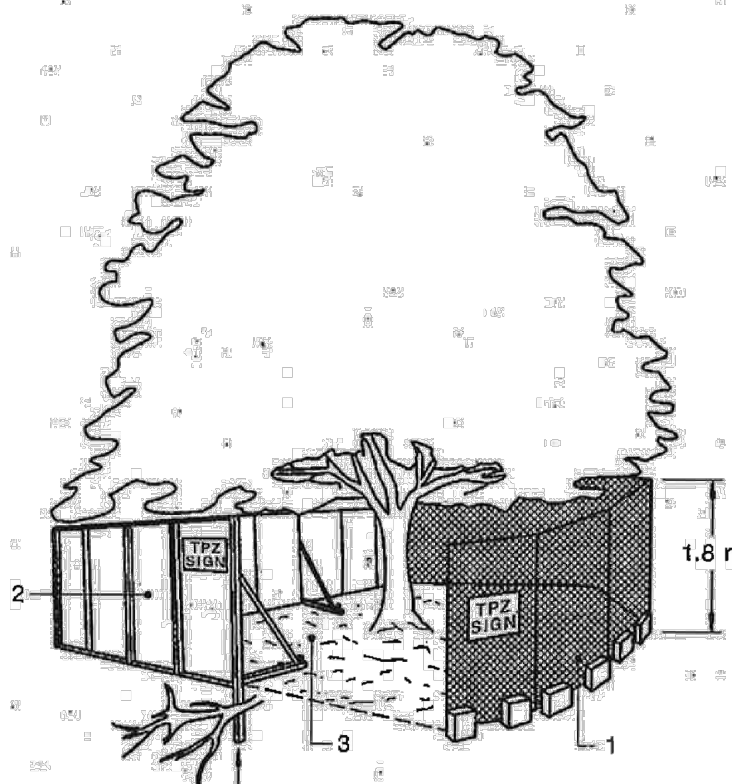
EXAMPLES OF TRUNK, BRANCH AND GROUND PROTECTION
